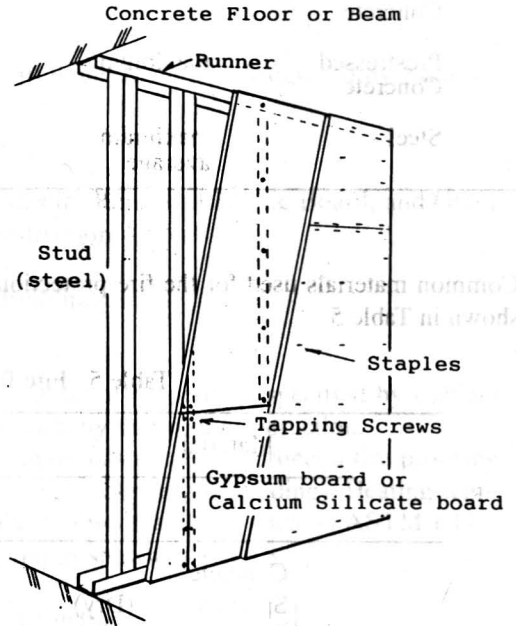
Details of Two-Ply Application of Party-Wall Fire-Protected.
